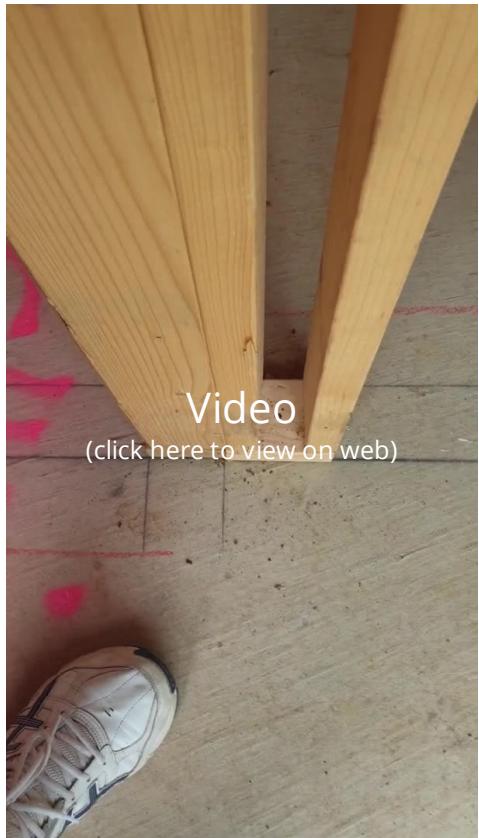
TYPICAL WALL JUNCTIONS
